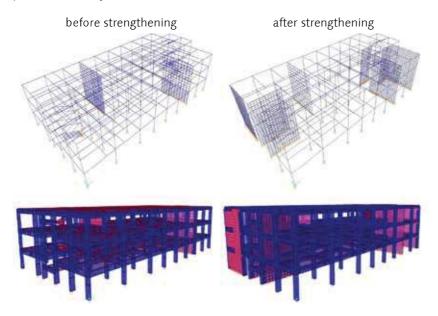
3D model before and after strengthening (Using shell elements for the modeling of the structural walls)
